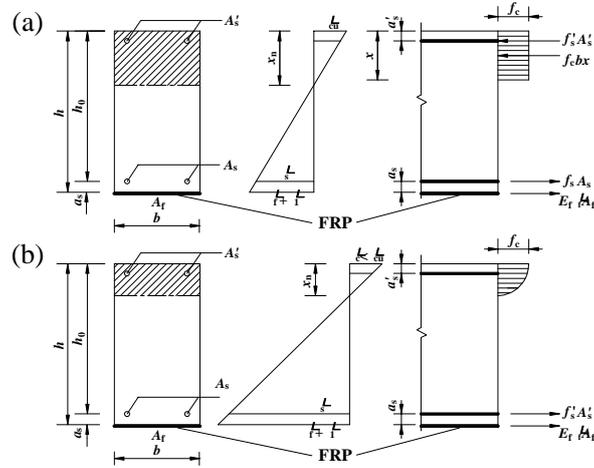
The calculation of bending capacity with FRP: (a) failure mode 1, and (b) failure mode 2
